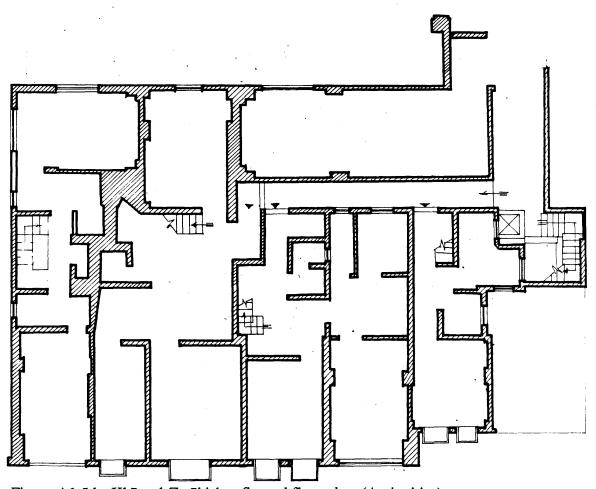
Khān al-Zarākisha. Second floor plan. (Antiquities)
